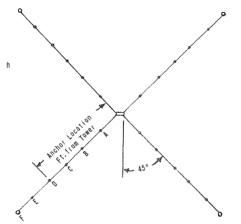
Tower and guy wires. Guy wire anchors should be located 42 feet from the tower.
